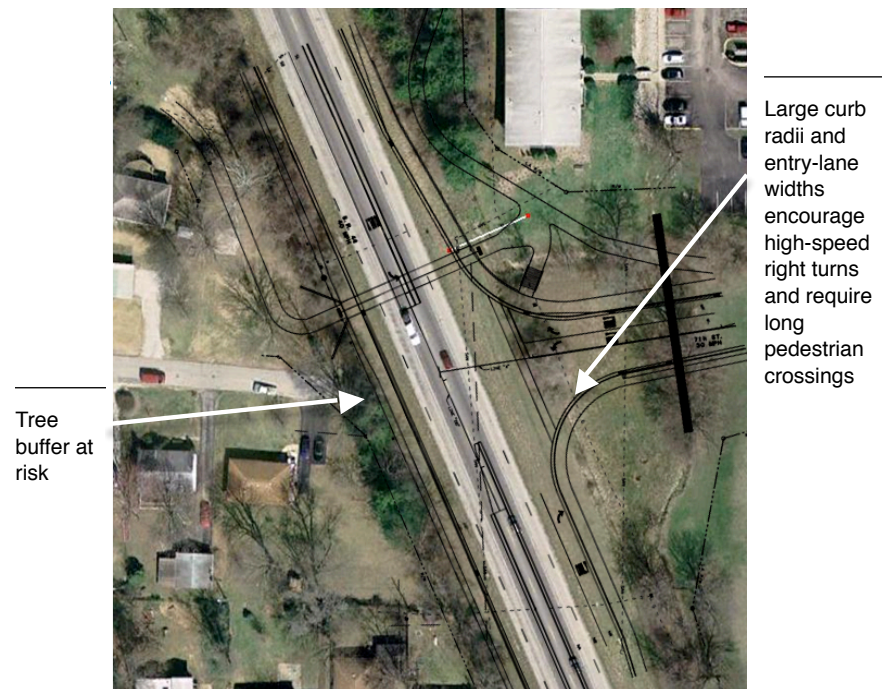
The Bypass at 7th Street. The new design adds a significant amount of impervious pavement.
